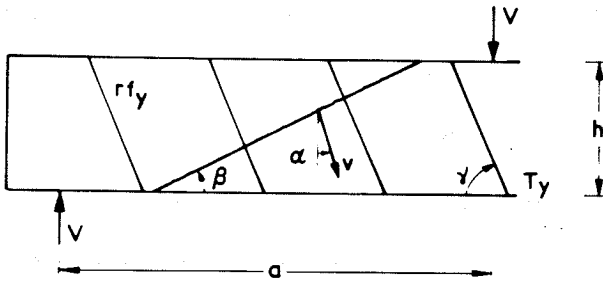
Failure mechanism of beam with inclined stirrups subjected to point loading
